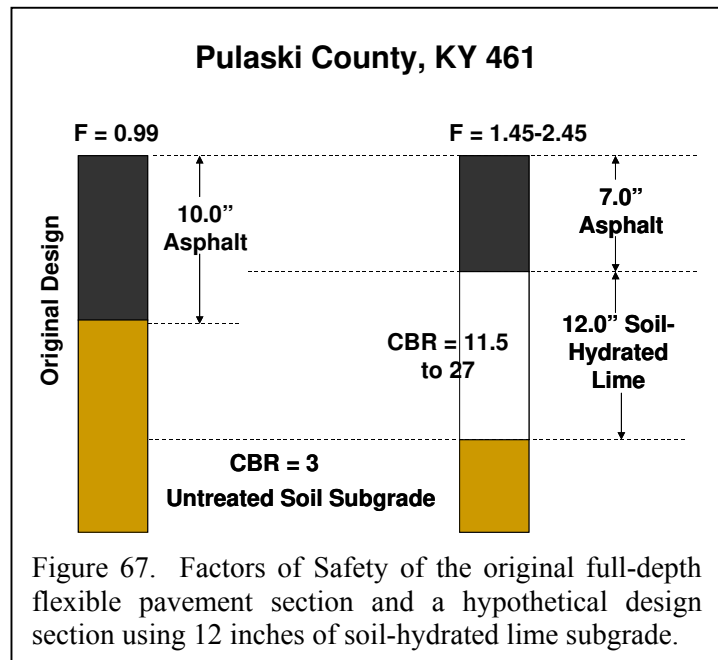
Factors of Safety of the original full-depth flexible pavement section and a hypothetical design section using 12 inches of soil-hydrated lime subgrade.
